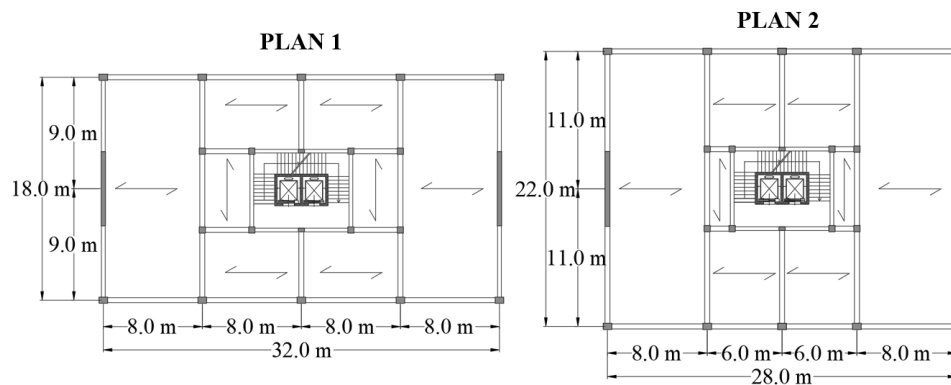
Plan view and dimensions of the benchmark building (left) and modified plan (right).
